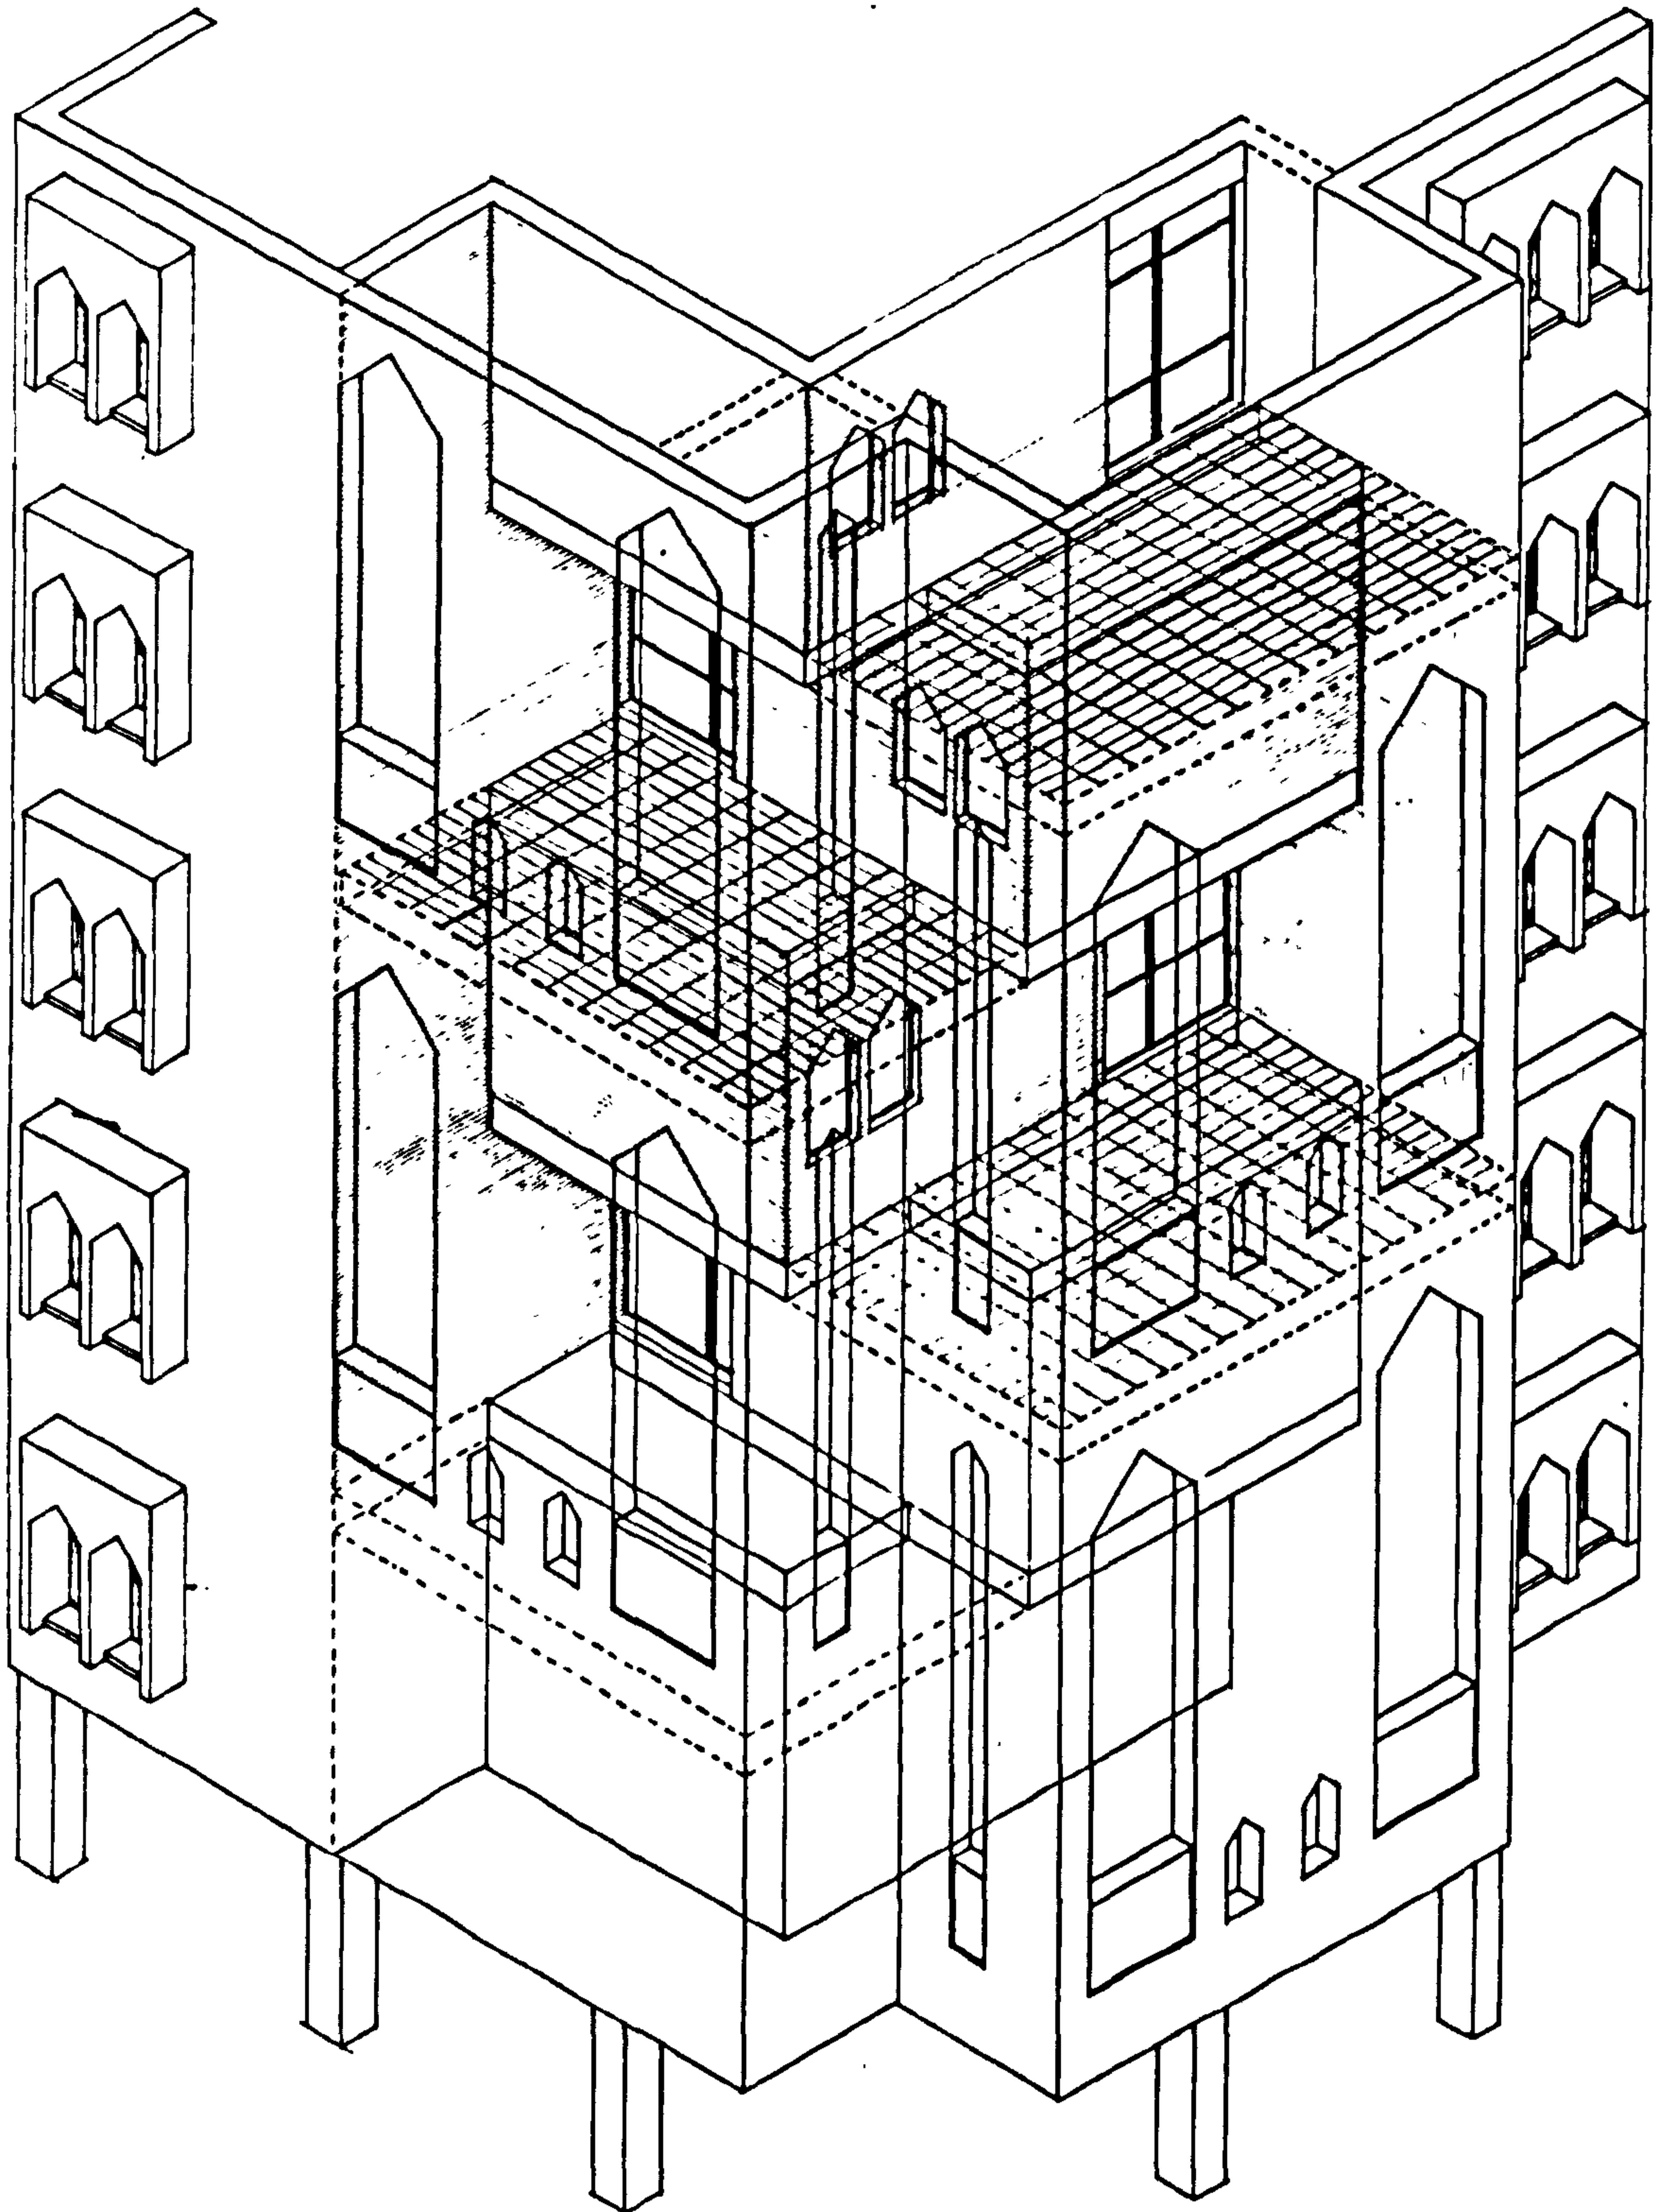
TYPICAL FLOOR PLANS FOR
